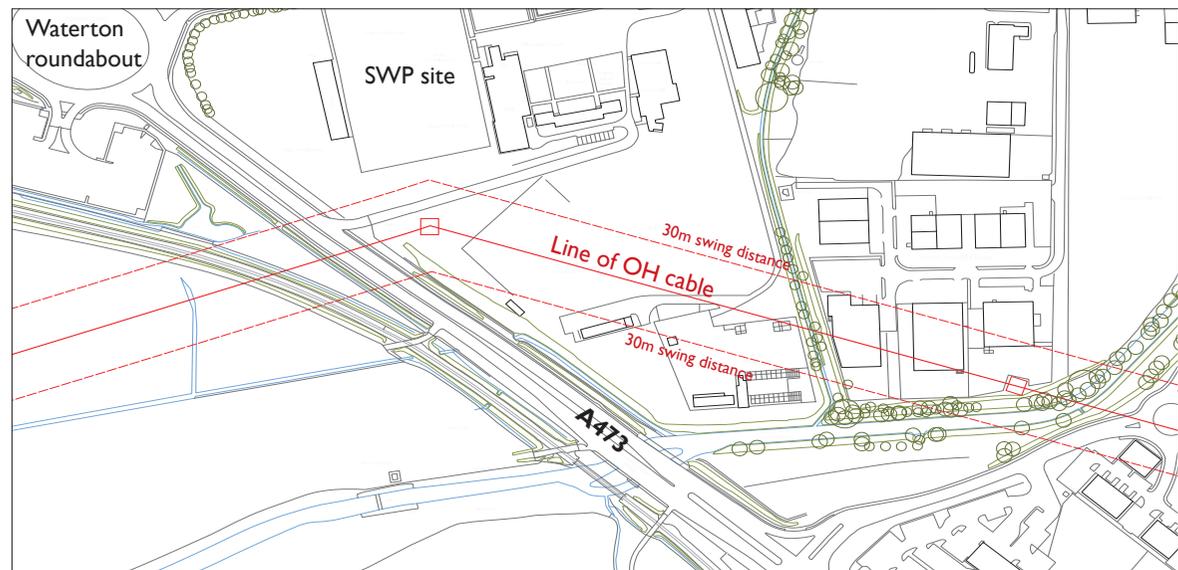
Plan showing existing line of overhead cables and associated swing distances
